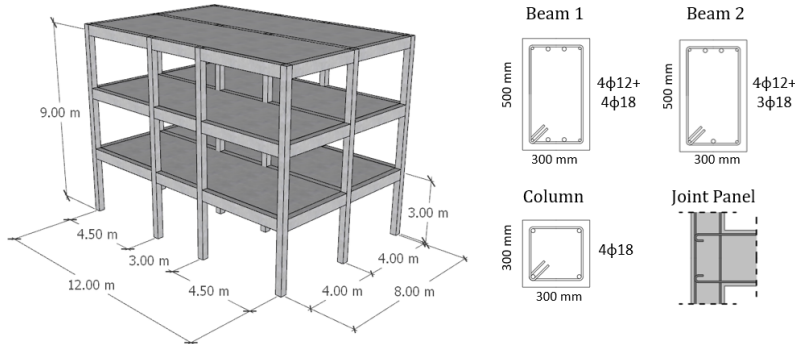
Global view of the case-study building (left) and geometrical details of RC members (right)
